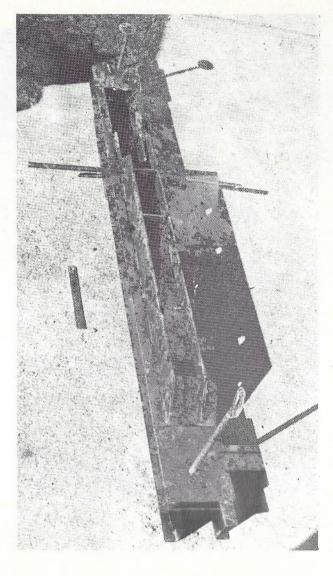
The Power Operated Scaffoldings 'Hanging Beam'.
